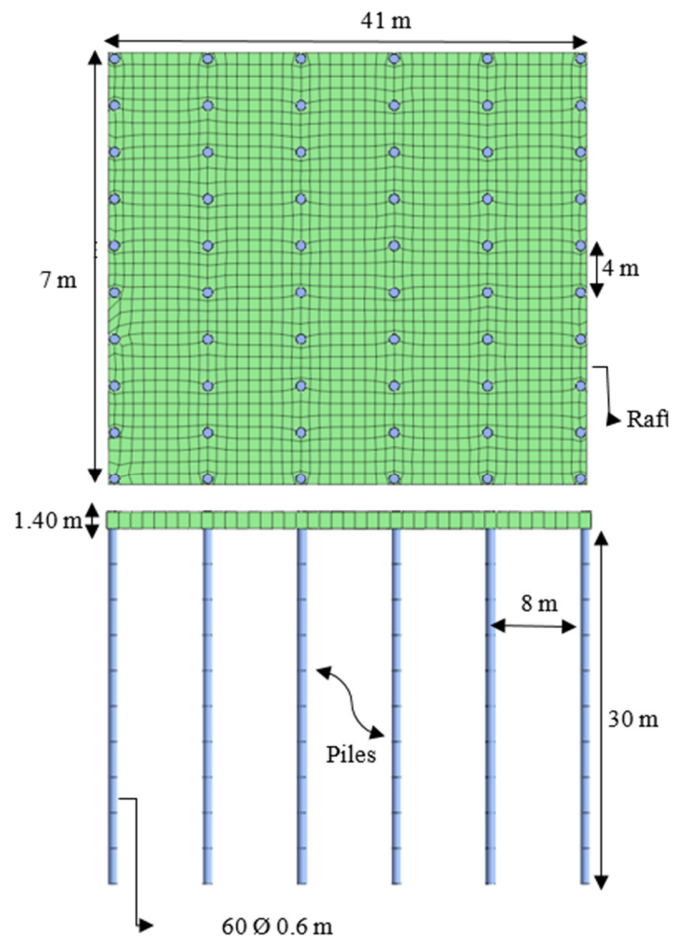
The dimensions of the piled foundation (elevation and plan).
